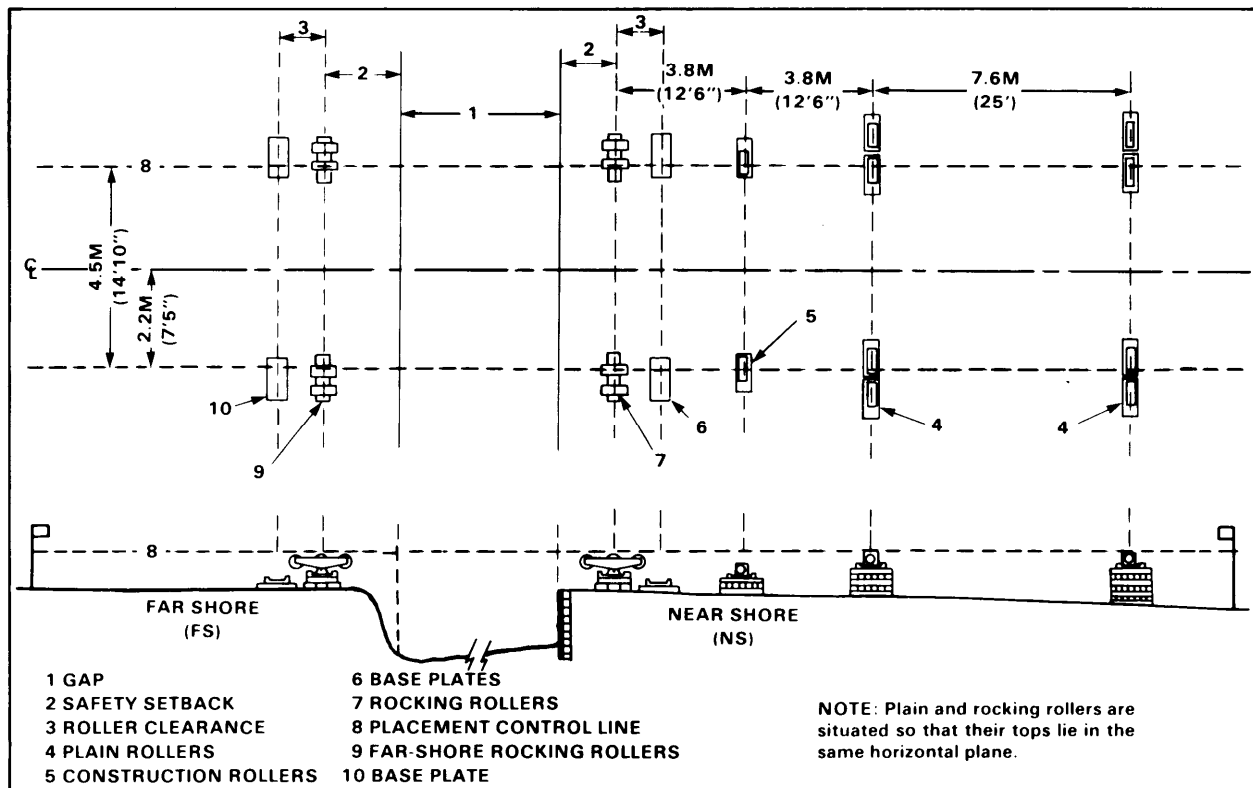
Plan and profile views of a typical roller layout for a triple-truss or multistory bridge
